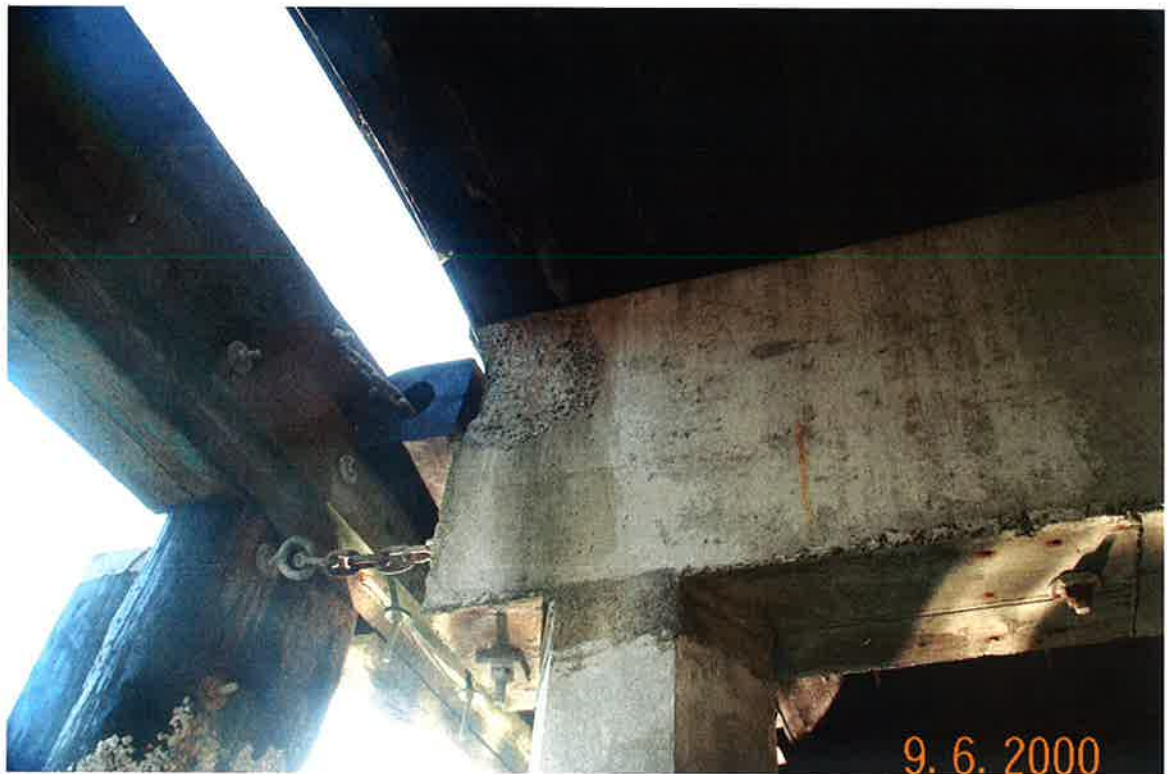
Spalling on pile cap corner at Pile No. 3G.
